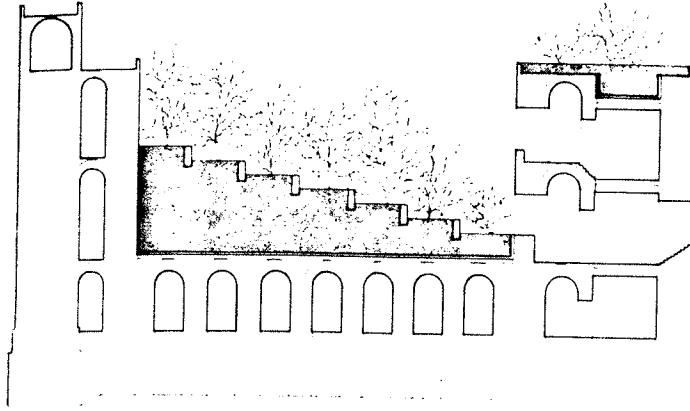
Reconstruction of the Hanging Gardens of Babylon by Koldwey (From Gollwitzer and Wirsing, 1962.)
